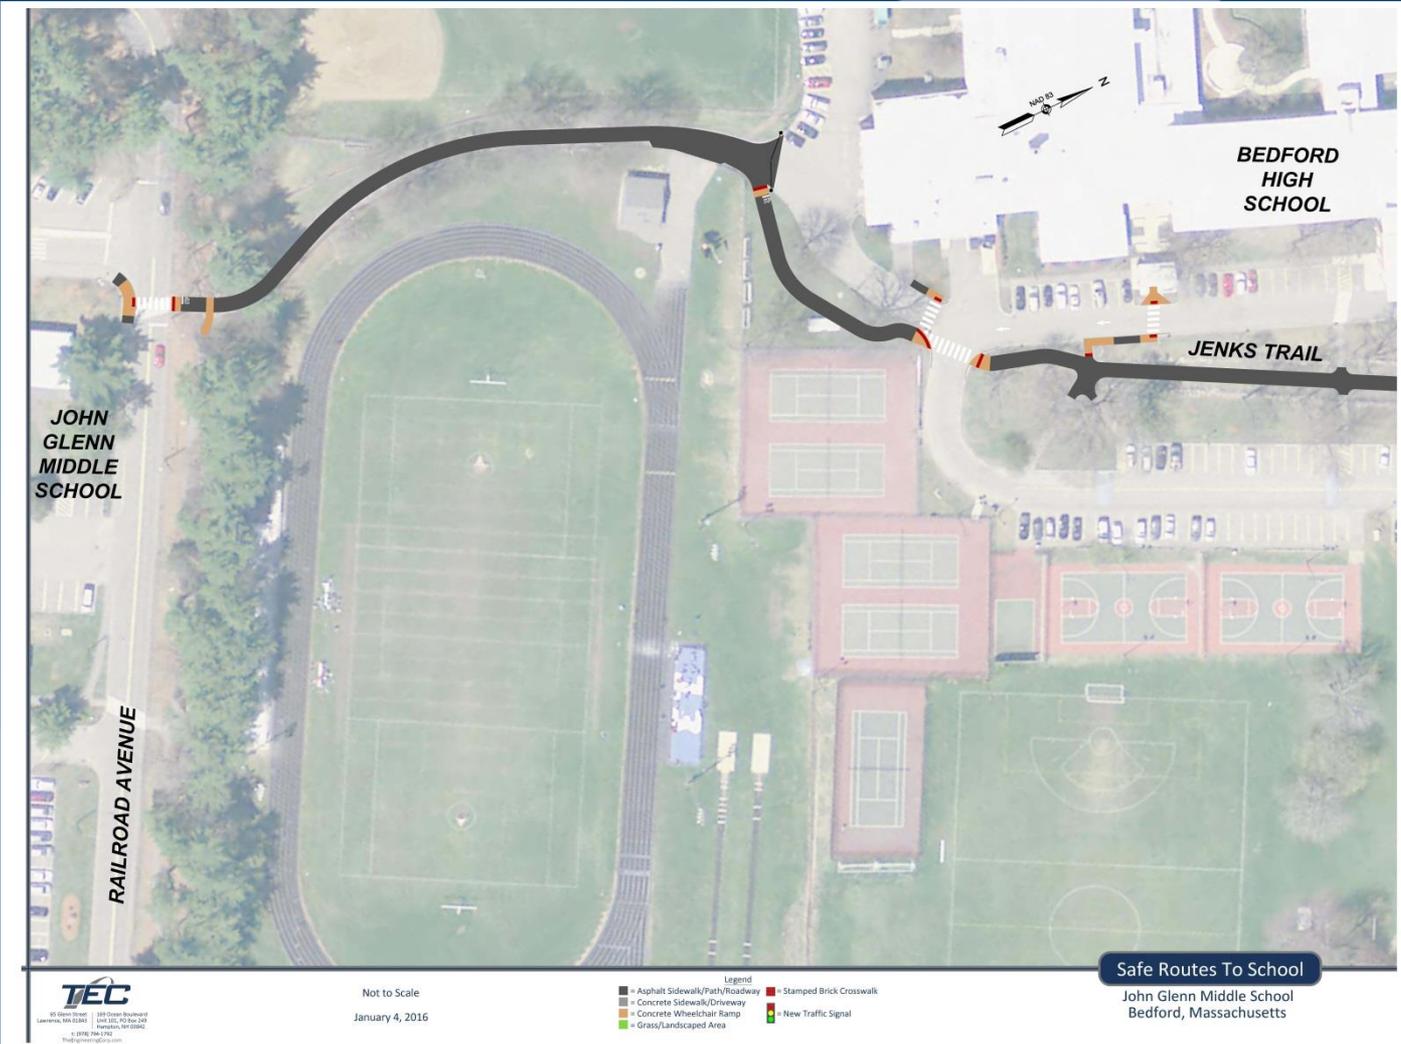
Construct Sidewalk Connection Between High School and Middle School
